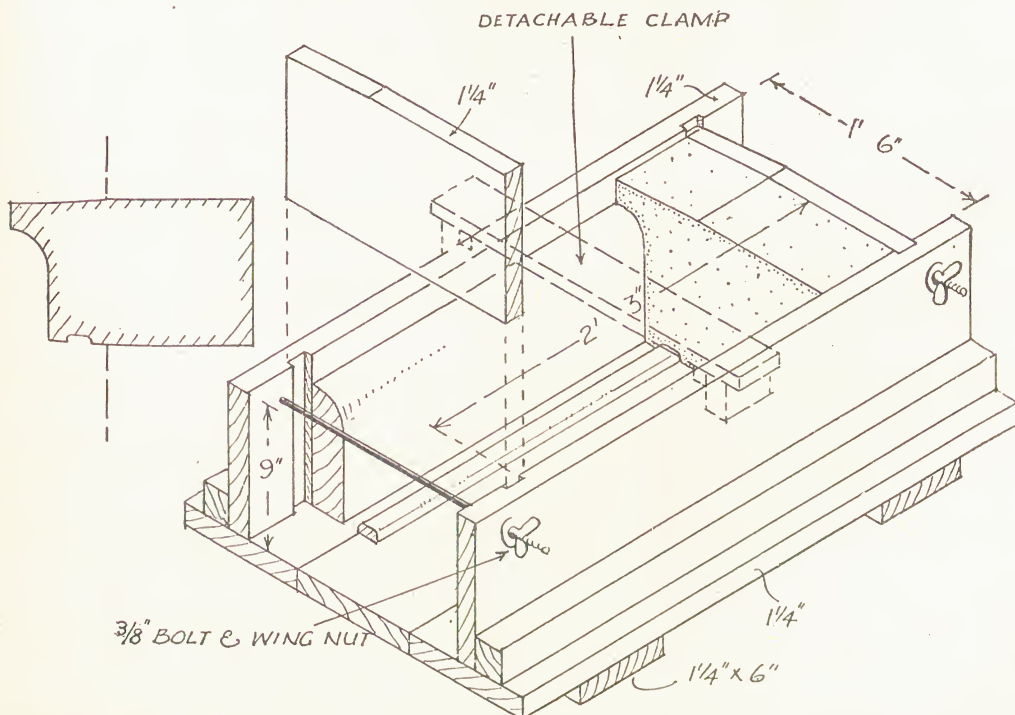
Wood hand mould for making pre-cast concrete cornice blocks.
